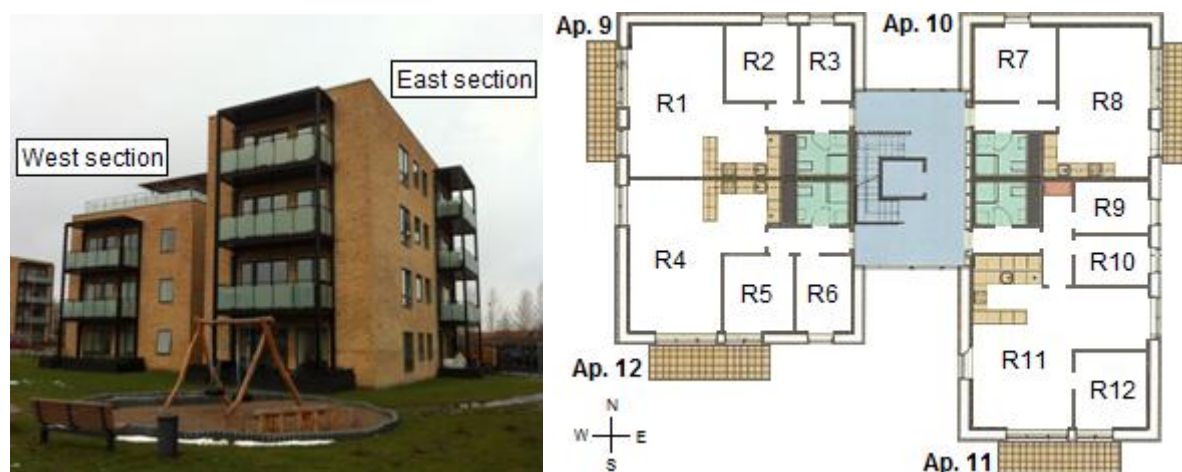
South east view of the investigated apartment building (left) and floor plan (right)
